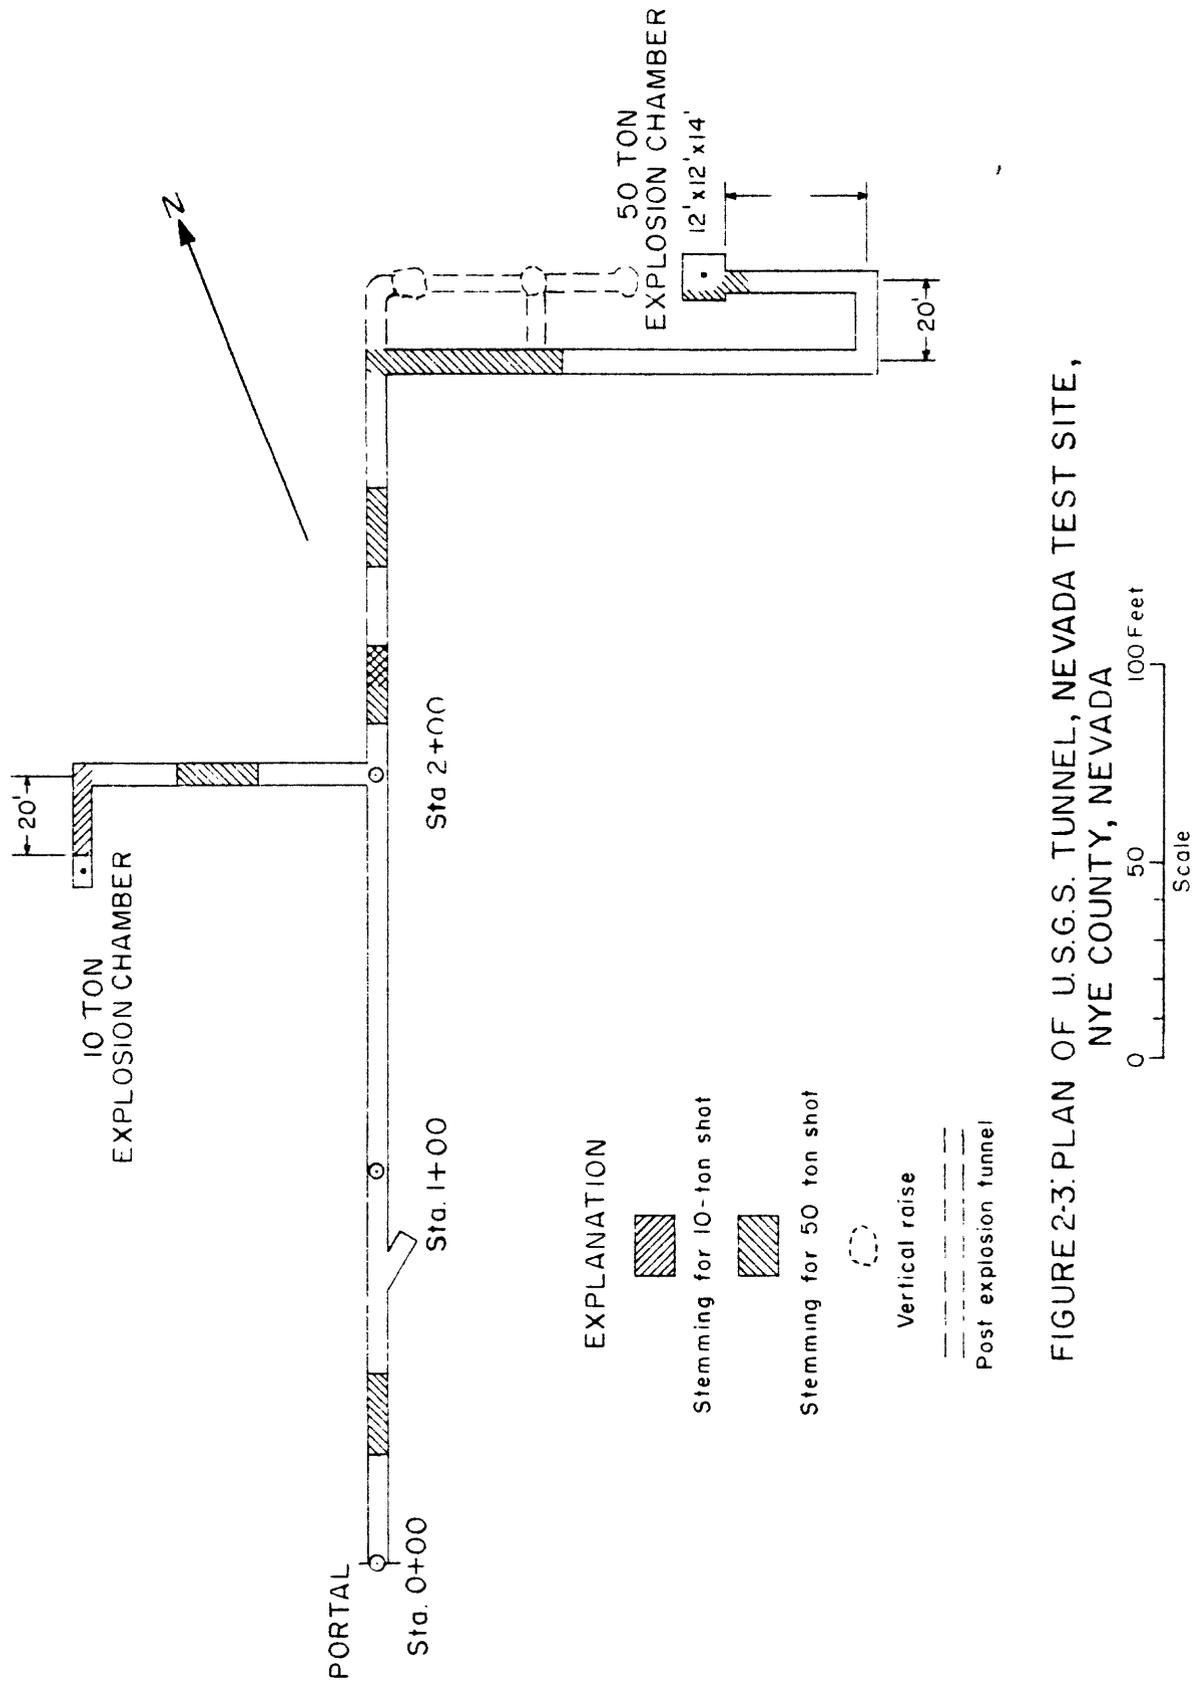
PLAN OF U.S.G.S. TUNNEL, NEVADA TEST SITE, NYE COUNTY, NEVADA
